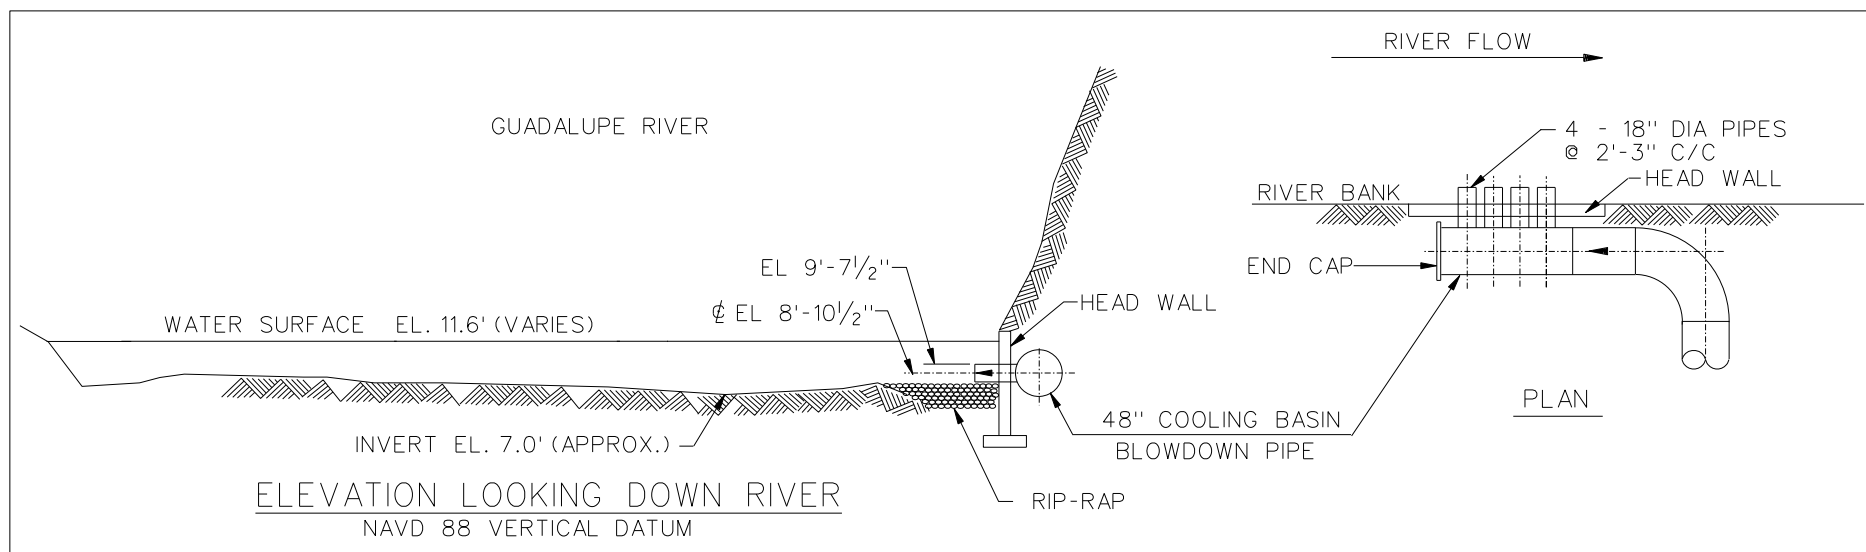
Blowdown Discharge Outfall — Typical
